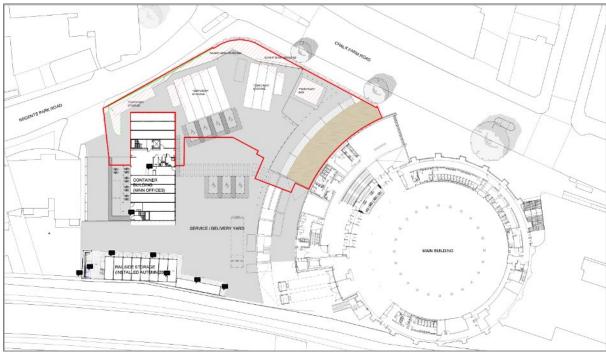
Extent of the Works Associated with the new Campus Building Indicated in Red
